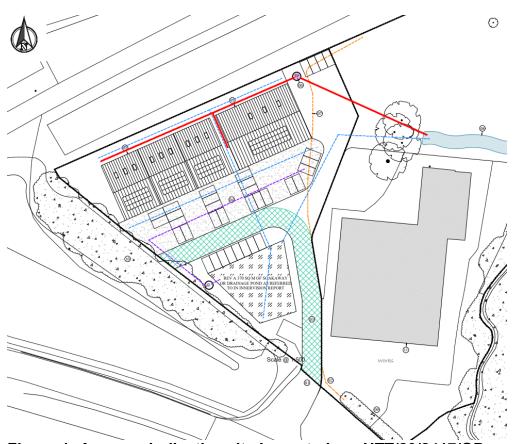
Approve indicative site Layout plan - UTT/20/2417/OP
